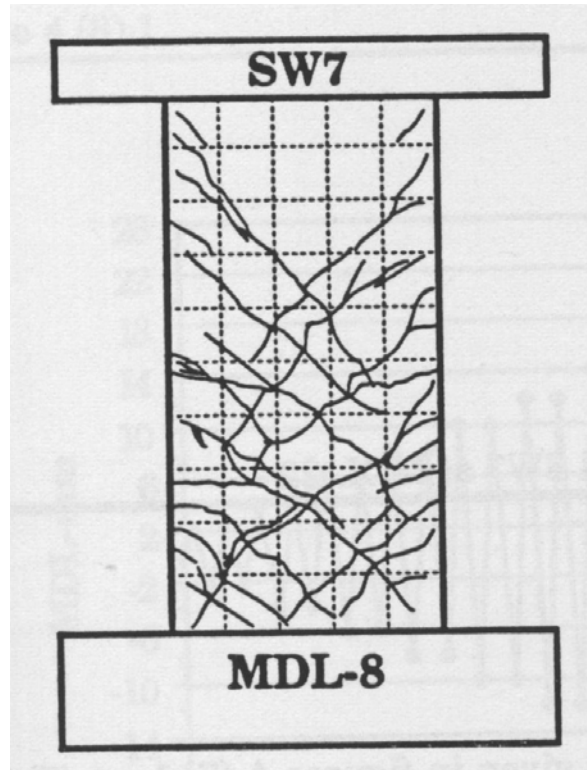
Condition of wall SW7 at 0.67% drift [Pilakoutas (1991)]
